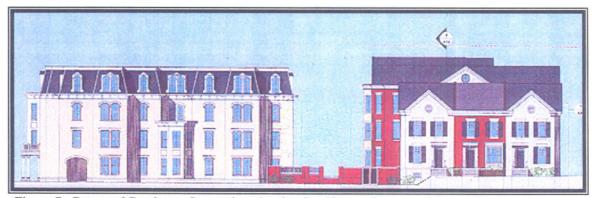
Proposed Powhatan Street elevation for Certificate of Appropriateness Review
